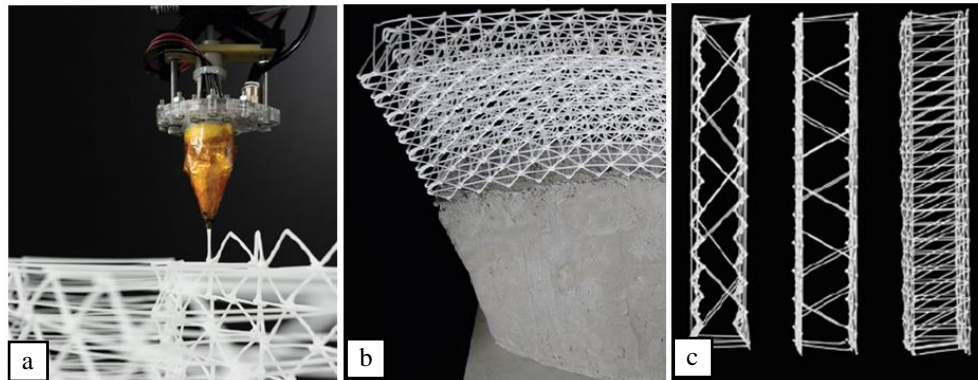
Mesh-mould combines formwork and reinforcement system for concrete [25]
